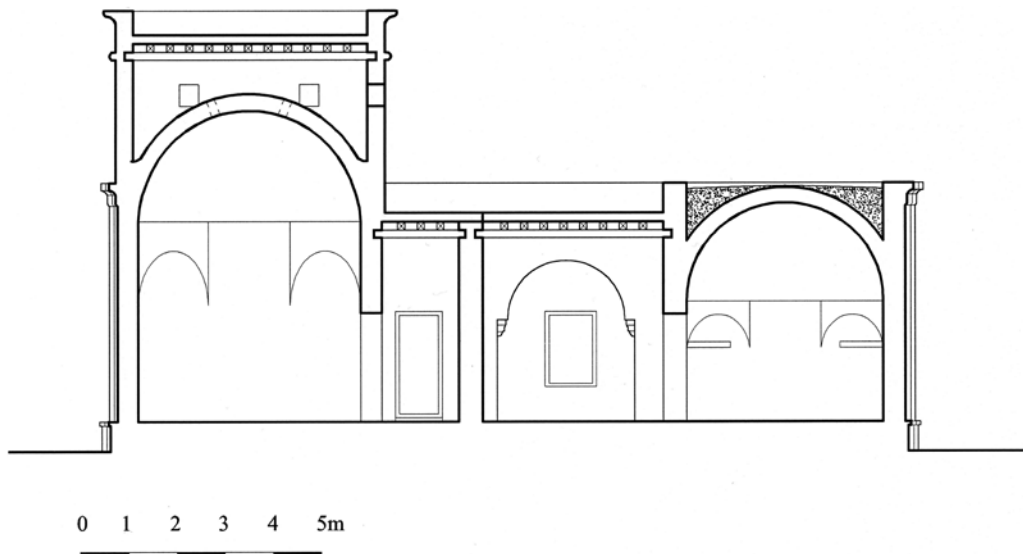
Fire temple, transverse section A–A through the two domed chambers, the corridor (h) and the hall (c), also showing the raised plinth and the flat roof structure.
